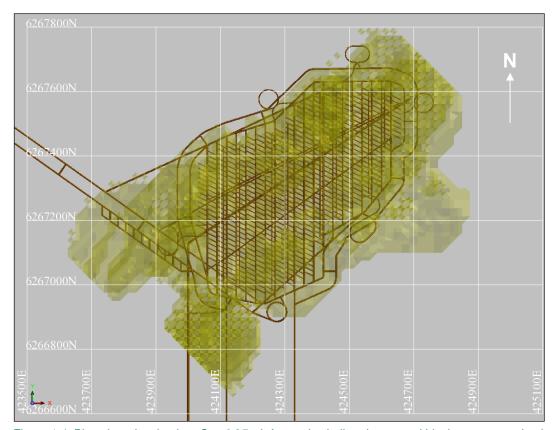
Plan view showing Iron Cap 0.25 g/t Au grade shell and proposed block cave extraction level footprint
